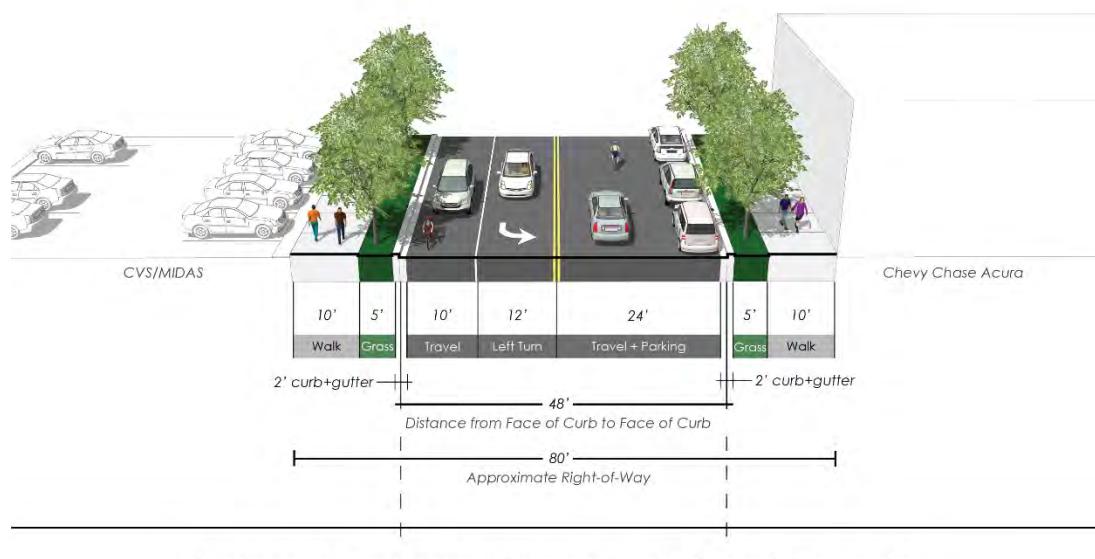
Recommended Typical Section for Chase Avenue (Tilbury Street to Pearl Street)
